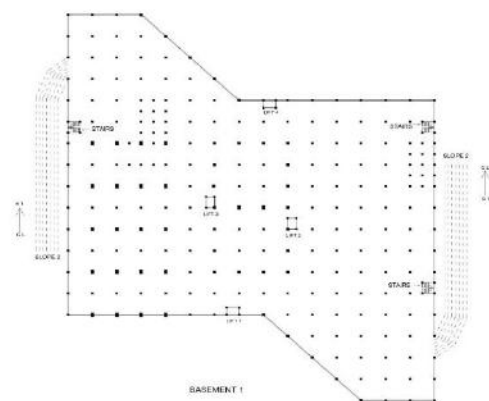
Basement 1 Plan Basement space - 19000 sqm
